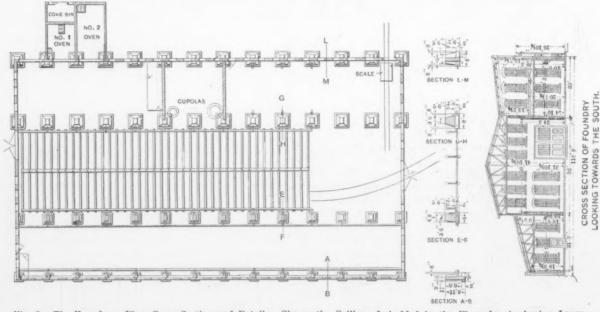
The Foundry.—Plan, Cross Section and Details. Shows the Grillage Imbedded in the Floor for Anchoring Large Molds.
